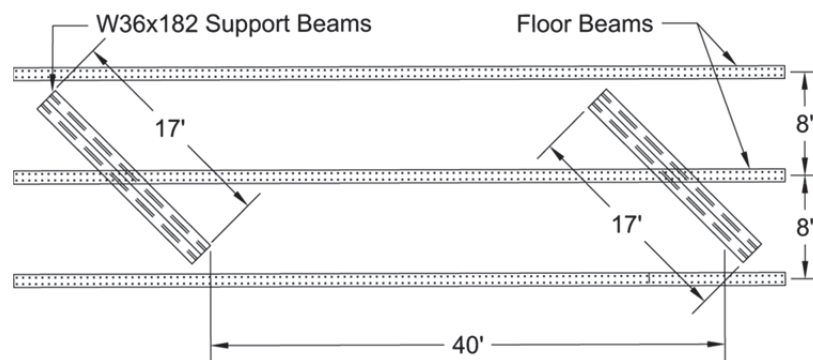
Floor Layout (Ahsan, 2012) Used under fair use, 2013
